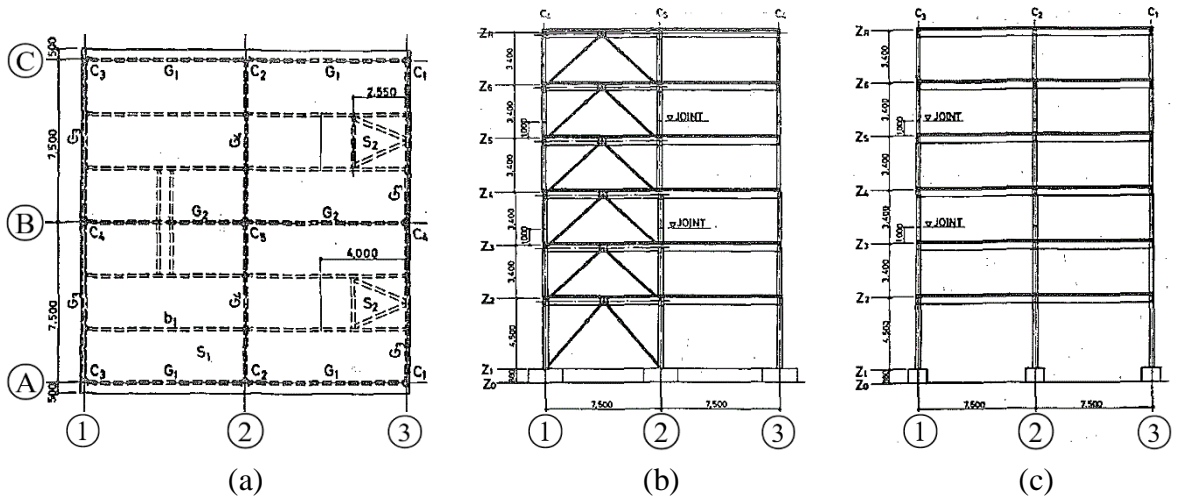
UJ-CERP 6-story steel building: (a) floor plan; (b) elevation line [B]; and (c) elevation lines [A] and [C] (modified from Foutch et al., 1987).
